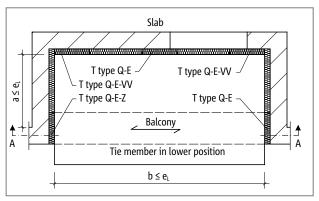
Schöck Isokorb® T type Q-E-Z, Q-E: Layout of recessed balcony
